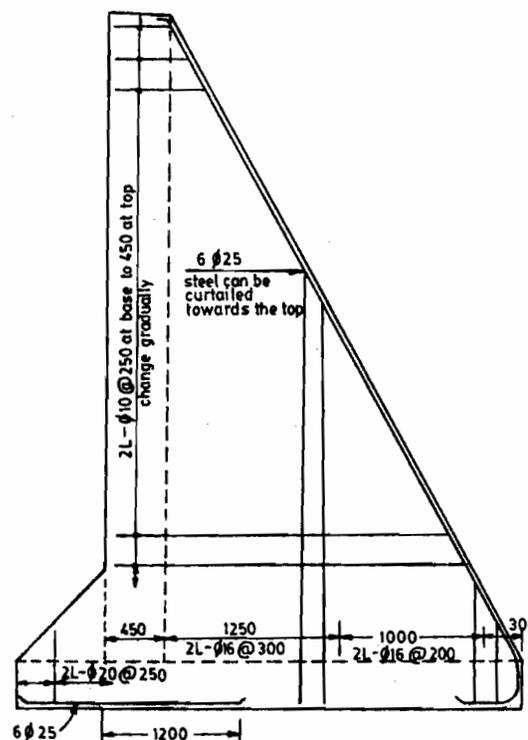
Reinforcement in Counterforts (*Slab Reinforcement not shown*)
